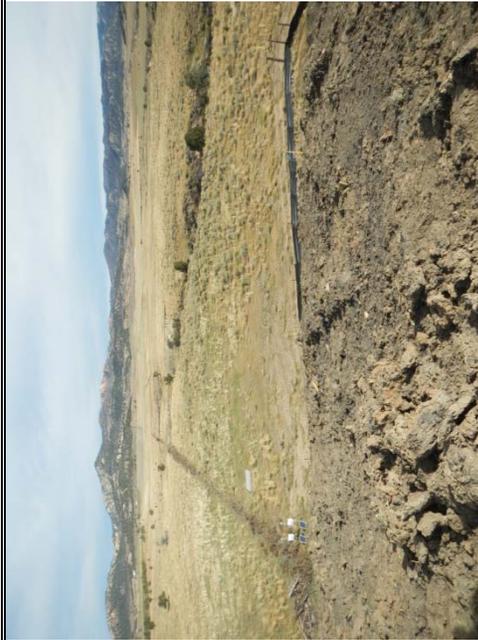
North Lease looking North at Pit 5. Haul truck gets loaded with Pit 6 spoil will travel across Pit 3&4 to dump at the North end of Pit 5. Sediment pond 6 inlet visible. DD8 was eliminated by Pit 6 highwall.
